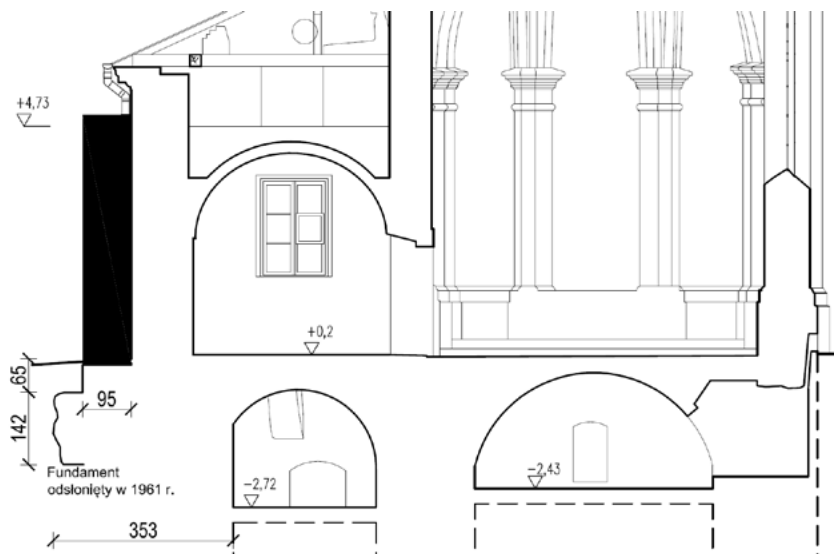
Wall discovered in the excavation of the northern sacristy wall
